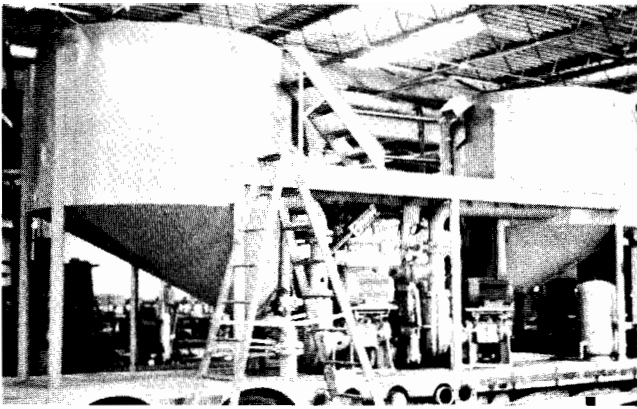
Colloidal mixing plant equipped with two 6-cu-yd capacity mixing chambers. (Courtesy of Great Lakes Construction Co., Spring Lake, Mich.)
